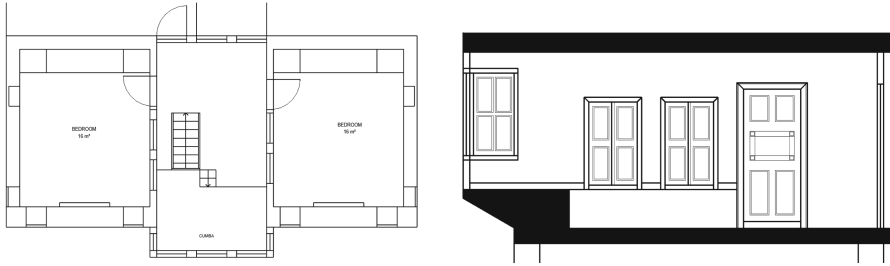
The plan of the first floor. A building details, two symmetrical entrance wall between corridor and bedrooms on the first floor. Drawings: Alicja Maciejko [1].
